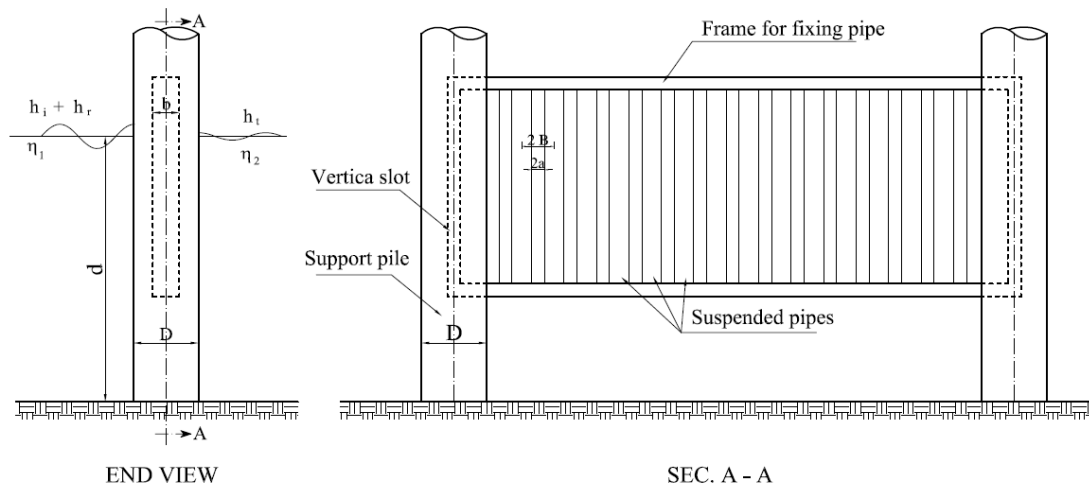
Details of suspended pipe breakwater. [47 - Mani, 1998]
